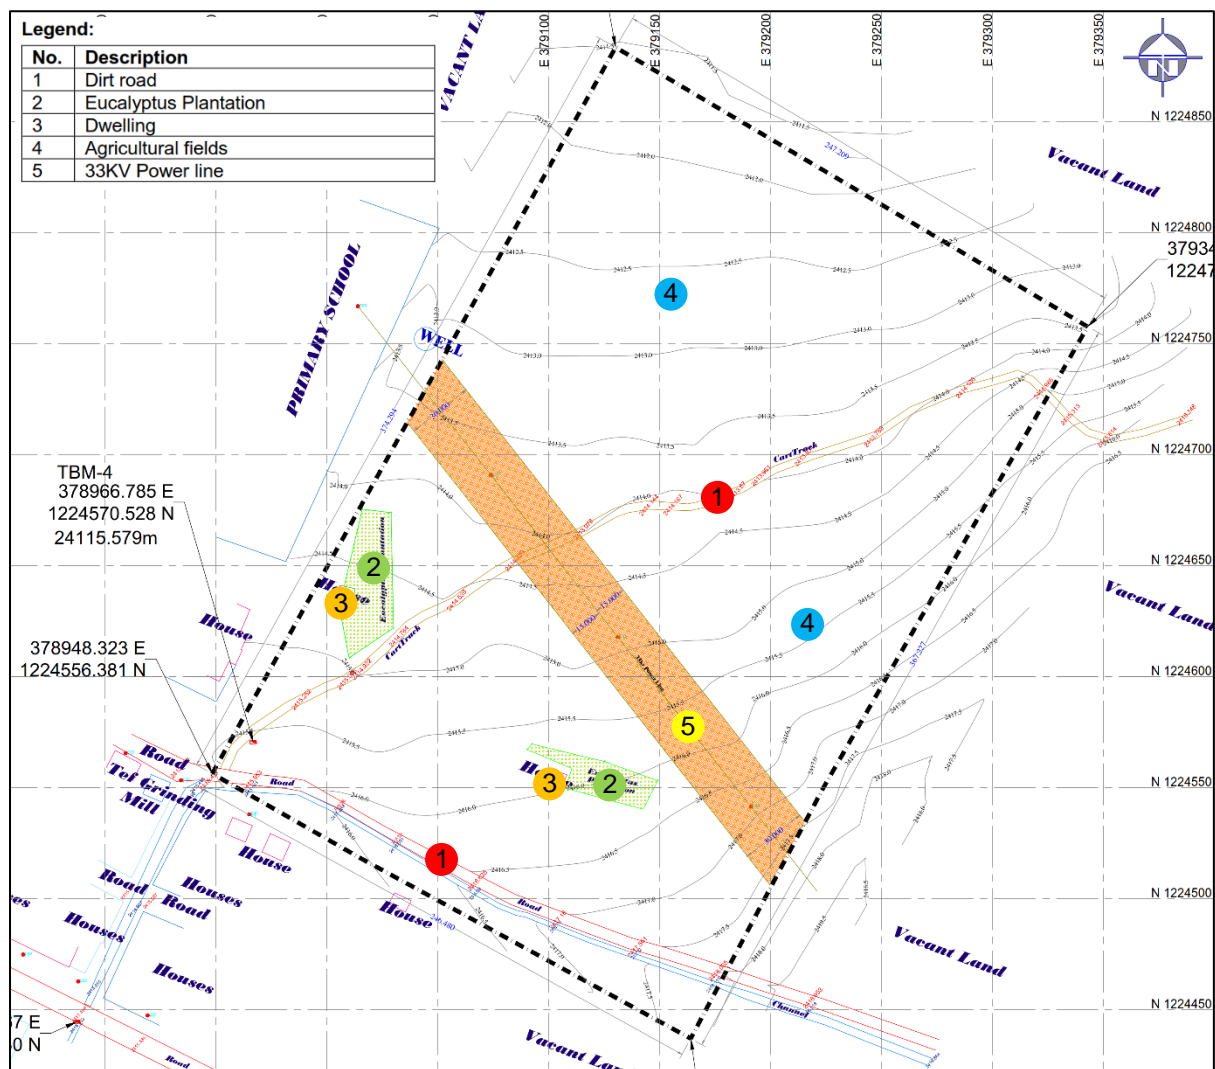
Existing features with the proposed RTC site (adapted from MA site constraints)
